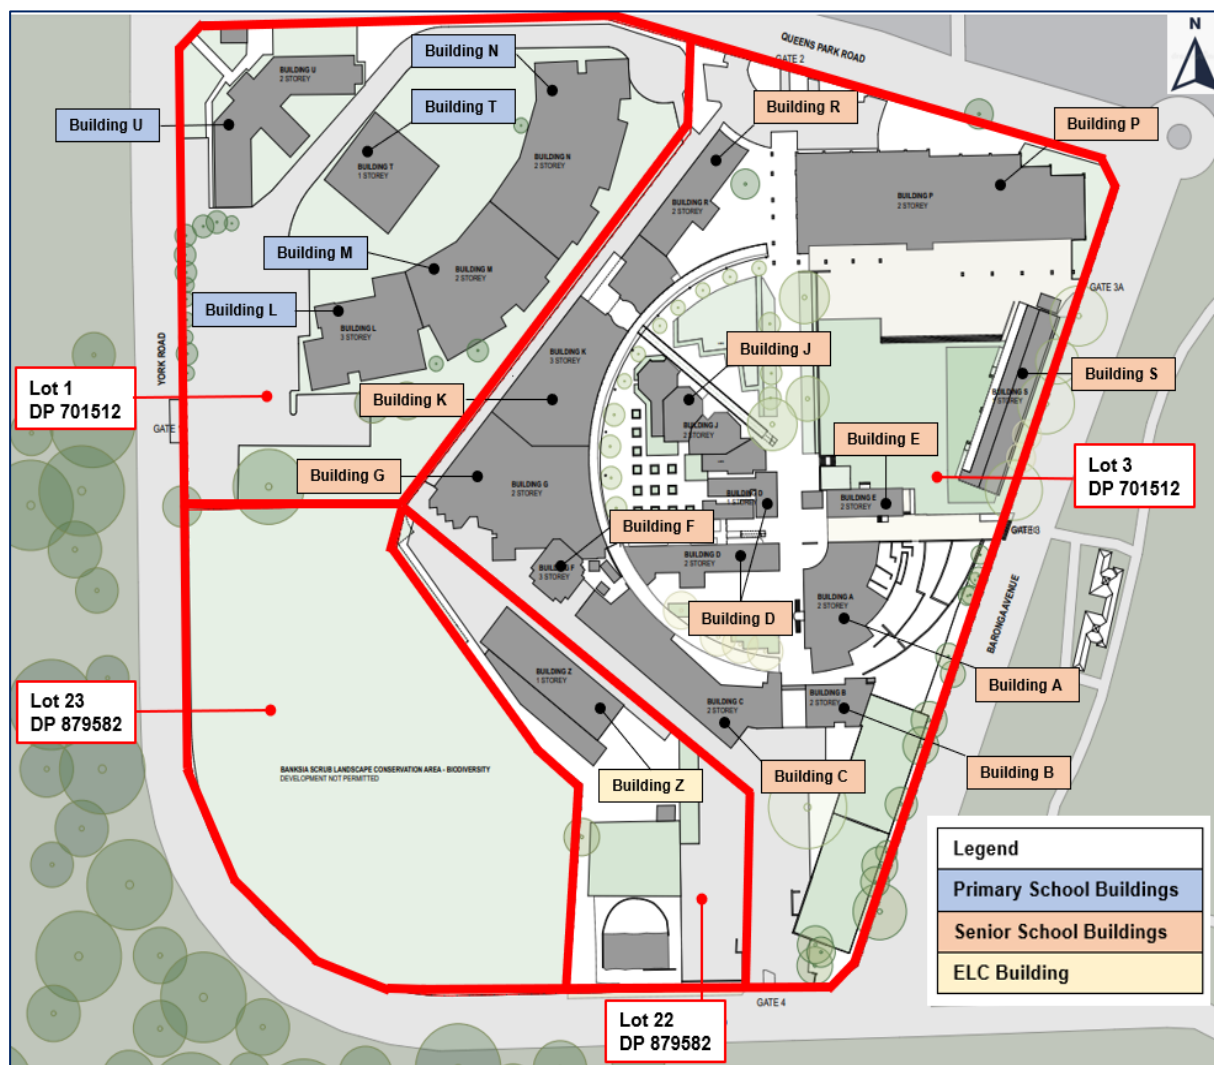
| Layout of existing school buildings (Base source: Applicant's EIS)
